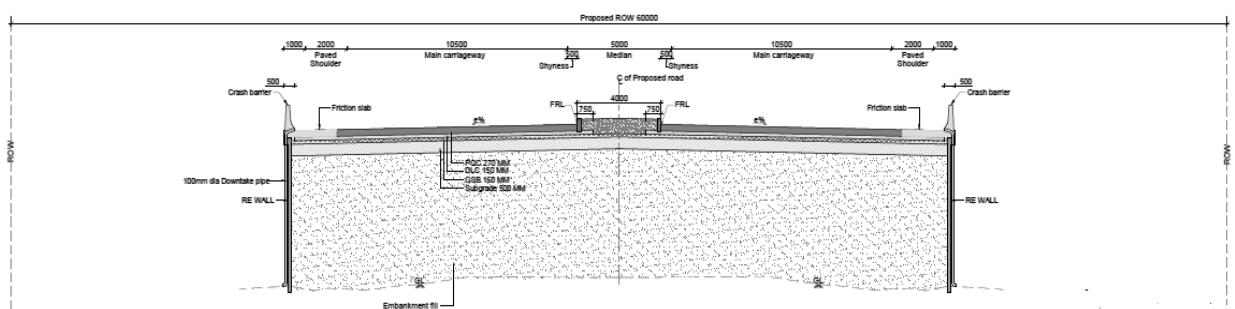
TCS-6B Typical Four Lane Underpass Cross Section with Slip Roads In Bypass & Realignment
